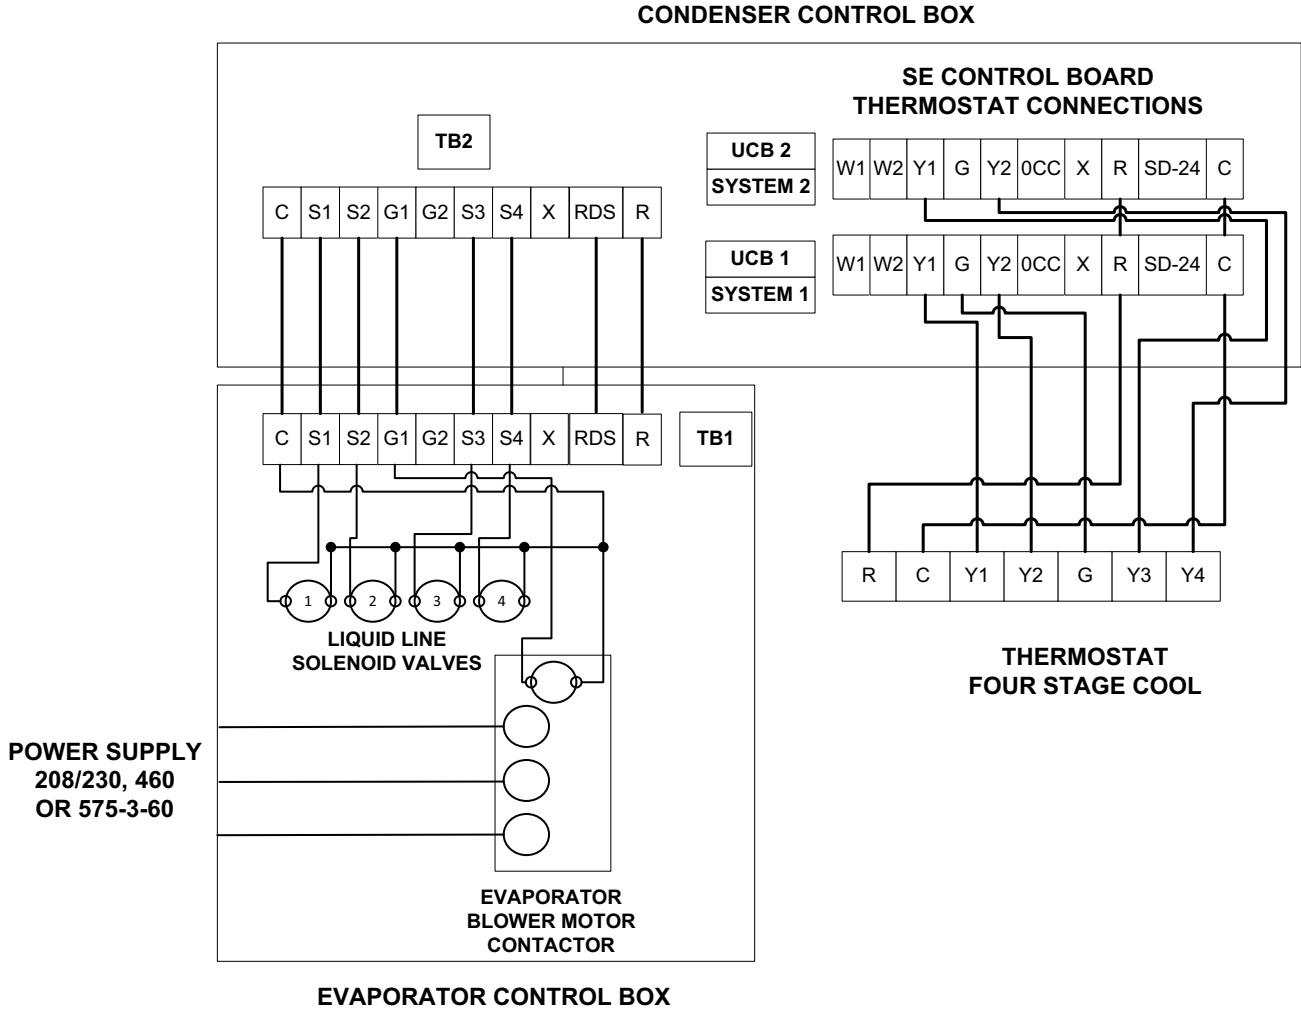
Typical field wiring diagram GD360/480 evaporator units, GD600 air handler and M2CZ600A evaporator coil when matched with KD360/480/600 condenser
